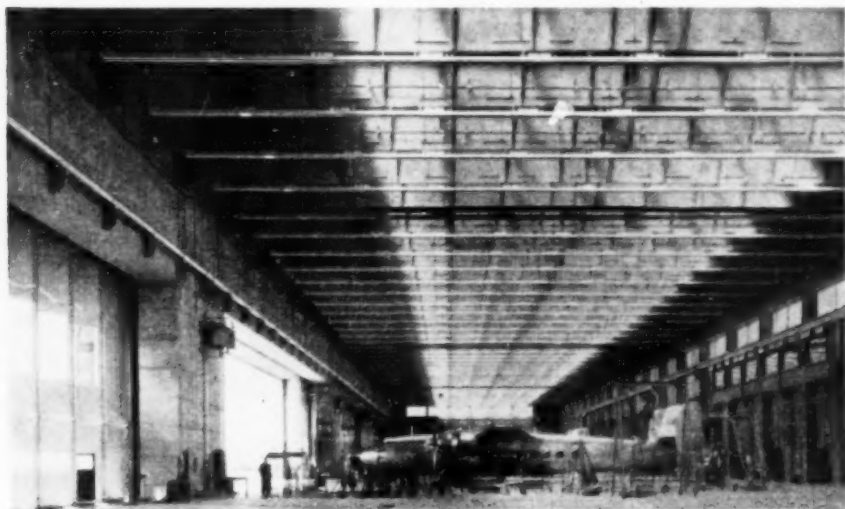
Elevation of Transverse Beams of the Hangars.
